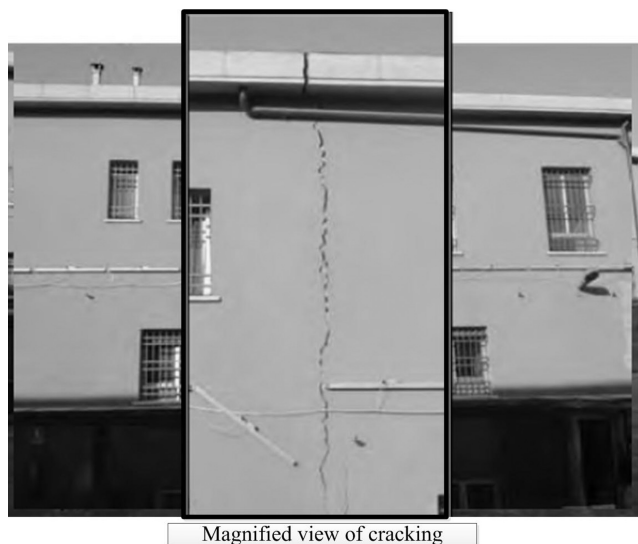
Cracking along western façade of building 106 (Borgonovo et al., 2007).
